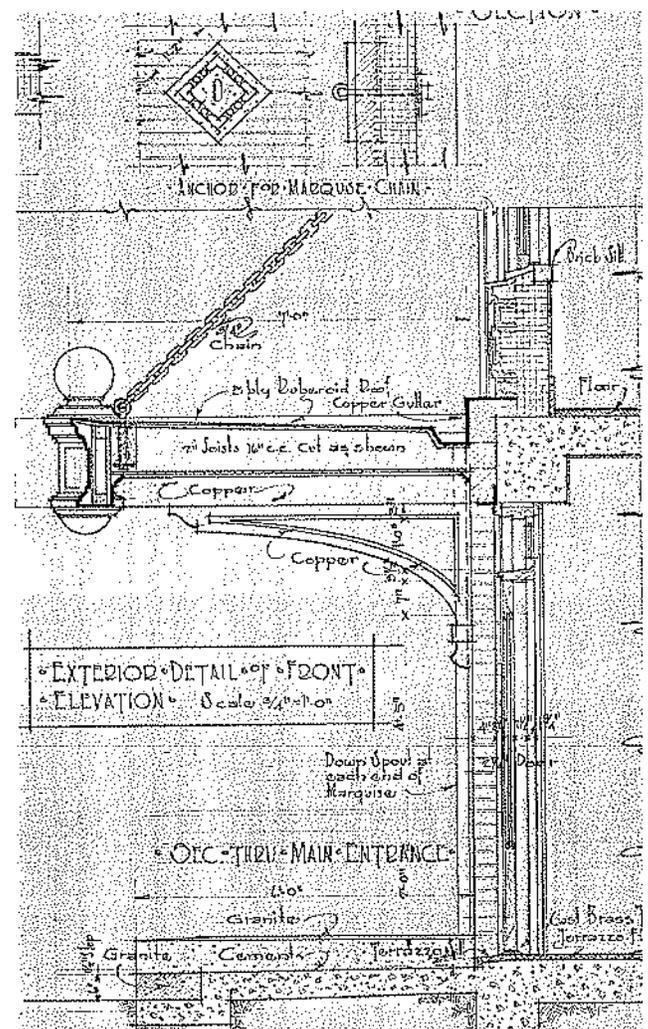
Marquis section from Sheet 11 of the 1921 construction drawings.
